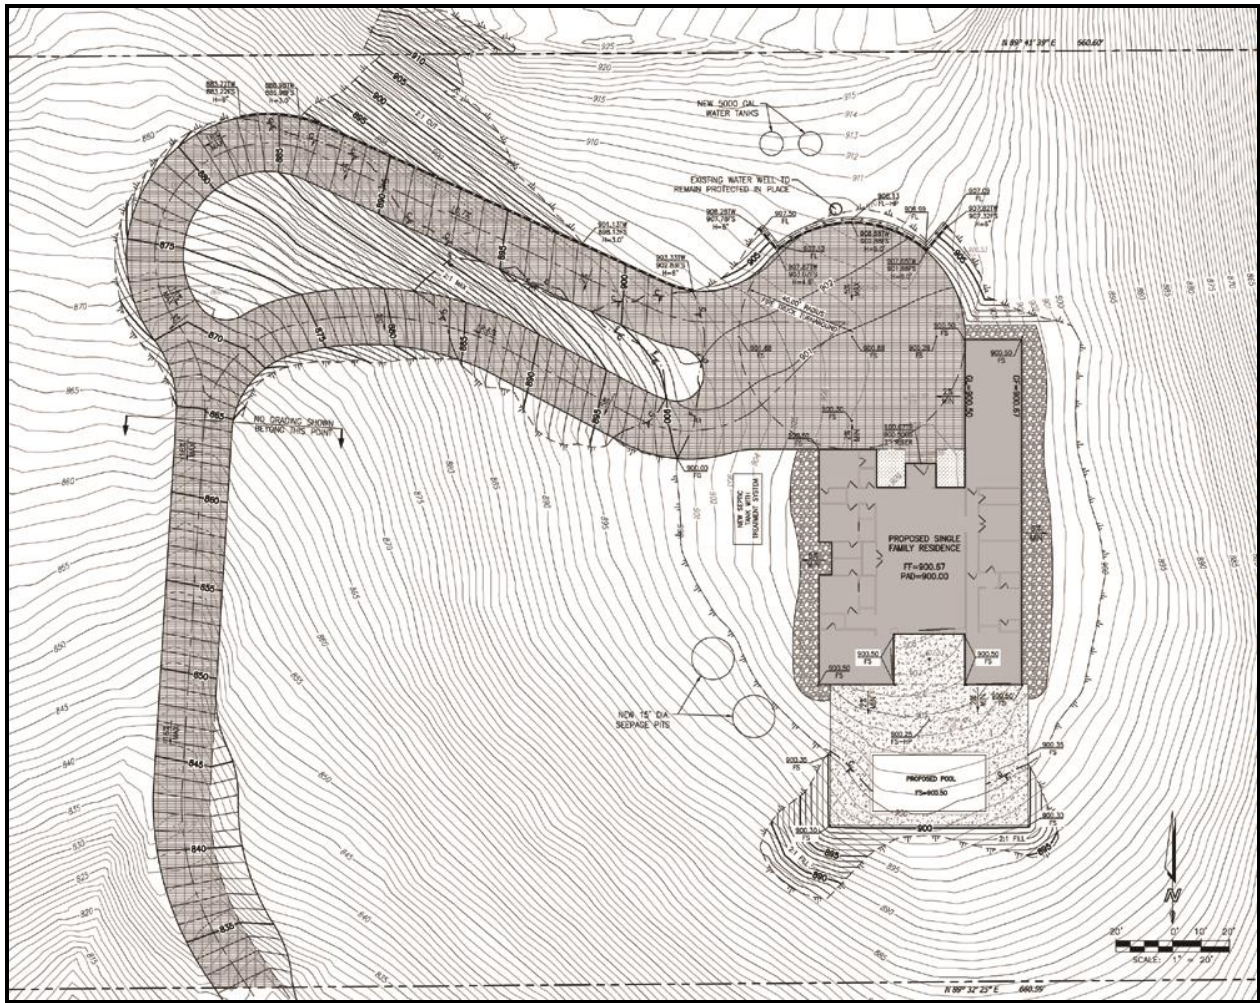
Preliminary Grading Plan for Proposed Residence and Driveway
